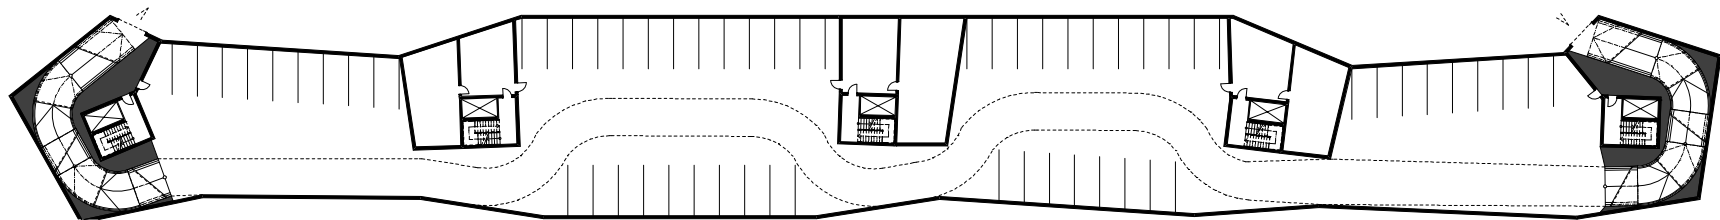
Design proposal of the cellar plan. Featuring underground parking and ventilation rooms, 1:750
